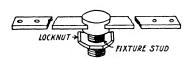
Ceiling Box or Bar Hangers with Stud and Lock Nut
